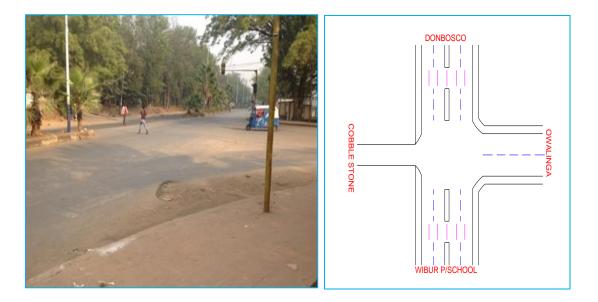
Baro Akobo Intersection (picture and layout view)
